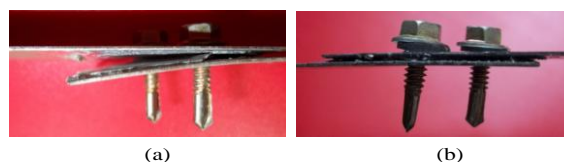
Axial failure of combination joints: (a) screw and an epoxy resin adhesive; (b) screw and a polyester resin adhesive
